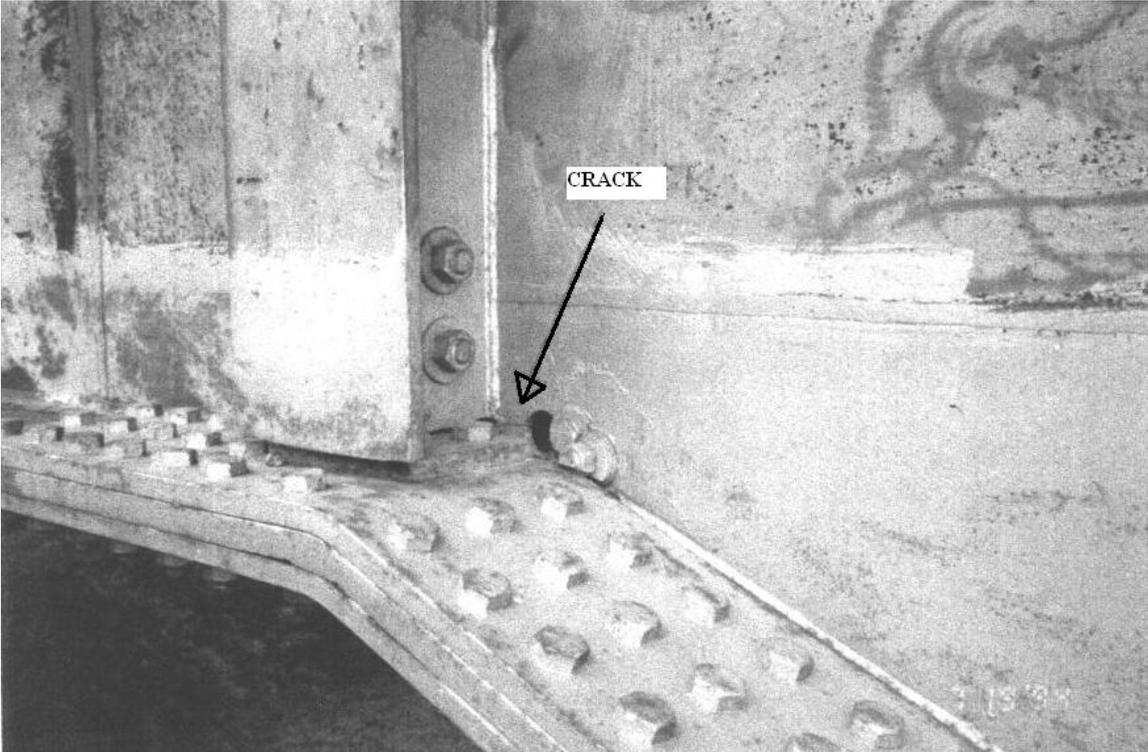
Haunch insert cracking (close-up) - Lexington Avenue Bridge (Wilson, October 2006)
